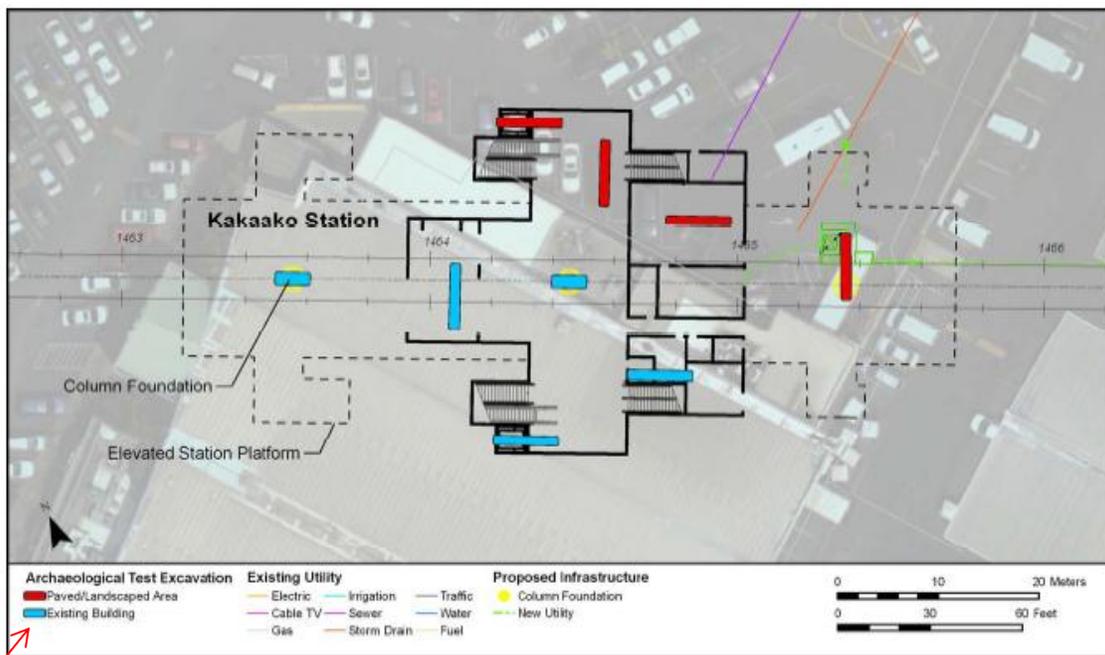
Kaka'ako Station, detail of column foundation layout showing proposed locations for archaeological inventory survey testing (test all three station column foundations with 3' by 10' excavations)
